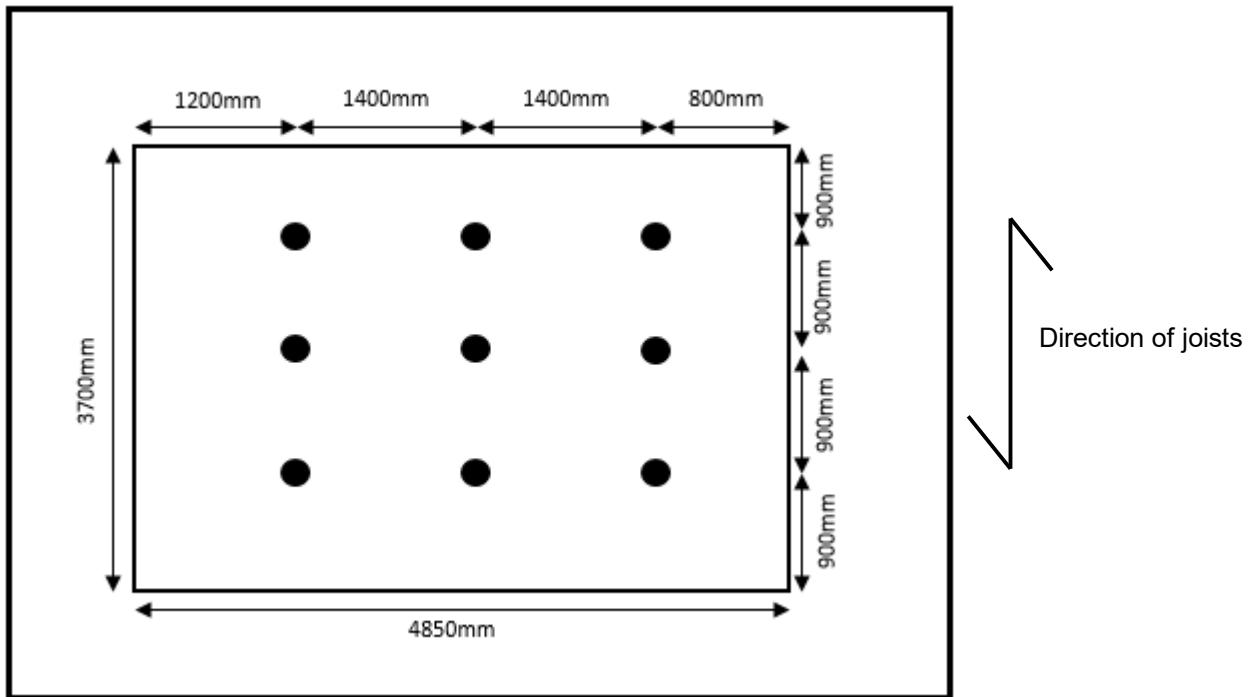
Positions of test specimens in the ceiling of the Robust Details Appendix F floor and direction of joists
